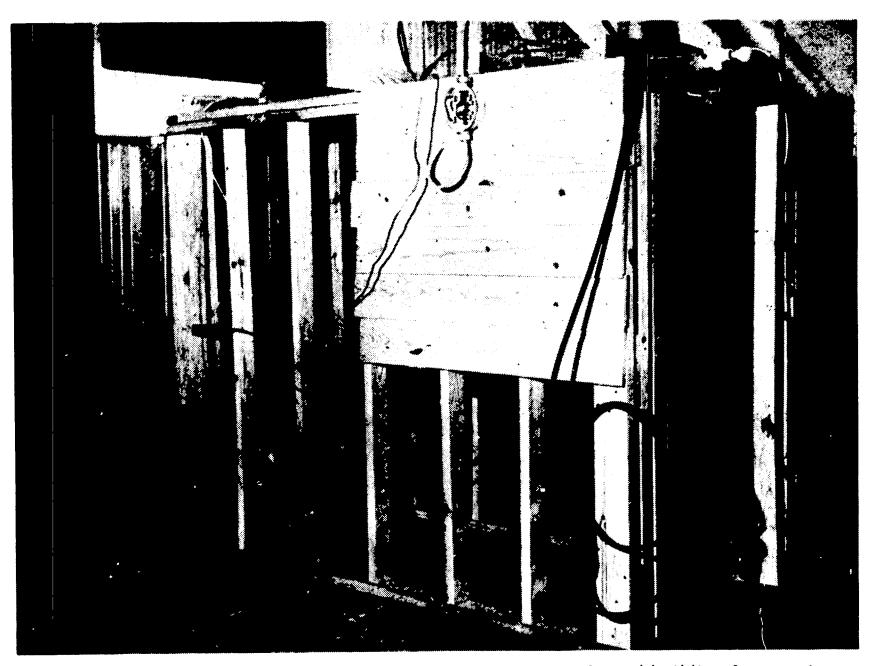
Portion of electricity laboratory work area, showing framed building for practice wiring. Size of building shown: length 8 feet, width 4 ft., height 6 feet. Framing conforms to good carpentry standards and utilizes good materials. The set-up here is a 220v service.
